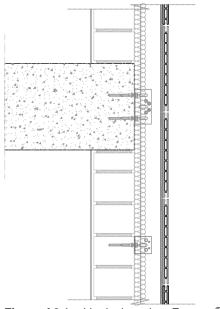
Vertical section. Faveton® SAH Acqua 20-H.
